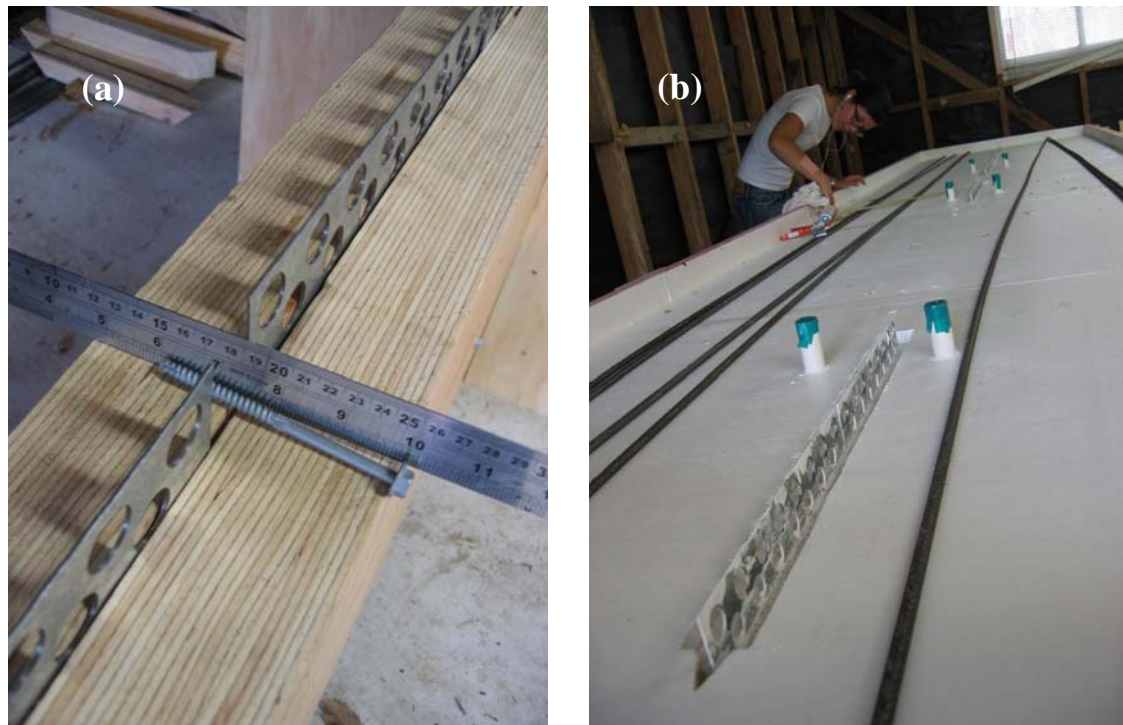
(a) 100 mm long type 17 screw used to connect 2-LVL together; (b) preparation of formwork and metal plate connection along the length of beam
